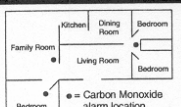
RECOMMENDED CO ALARM PLACEMENT FOR SINGLE FLOOR RESIDENCE
